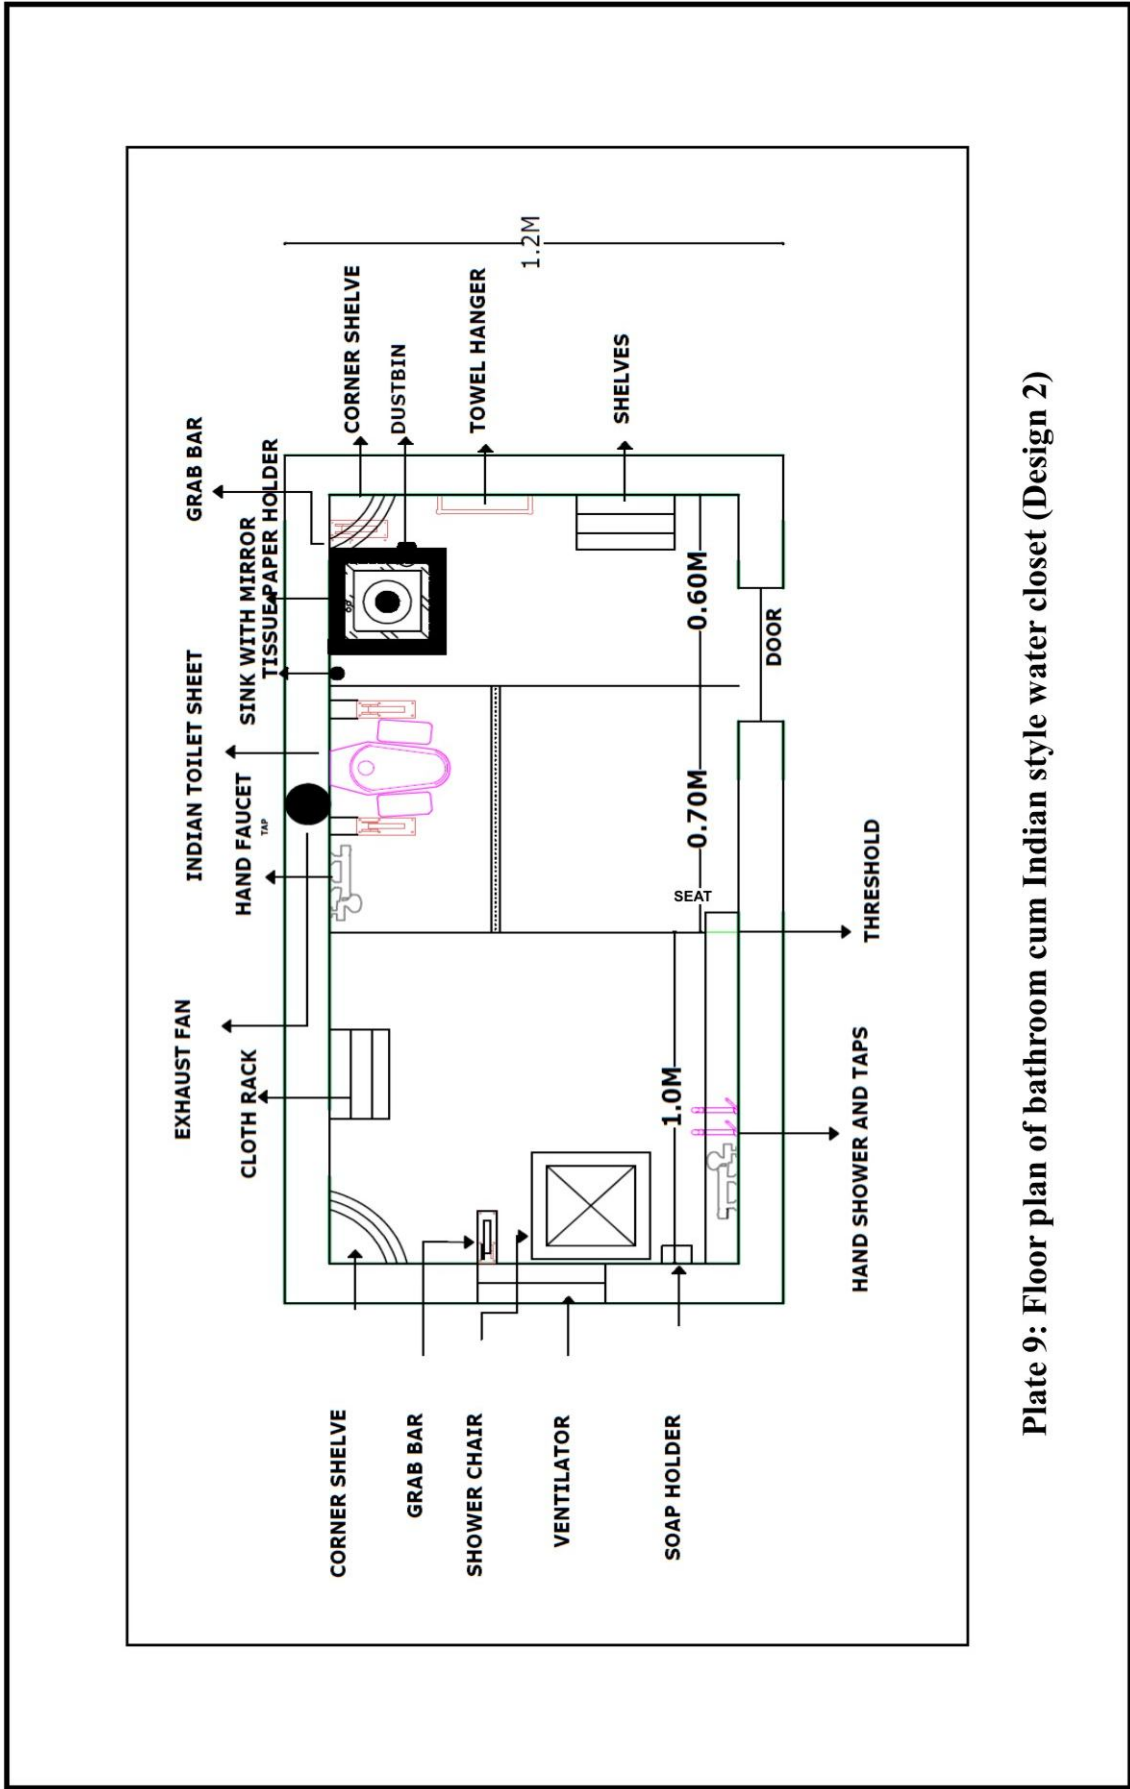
Floor plan of bathroom cum Indian style water closet (Design 2)
